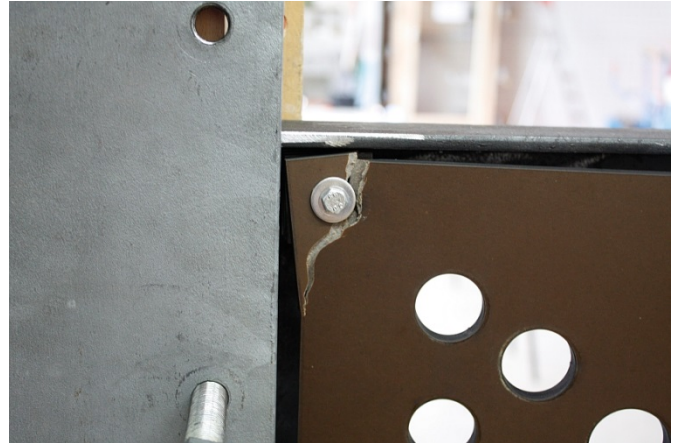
Failure of test assembly no. 101 at the fastening point at the maximum load of 4 kN (exterior view)
